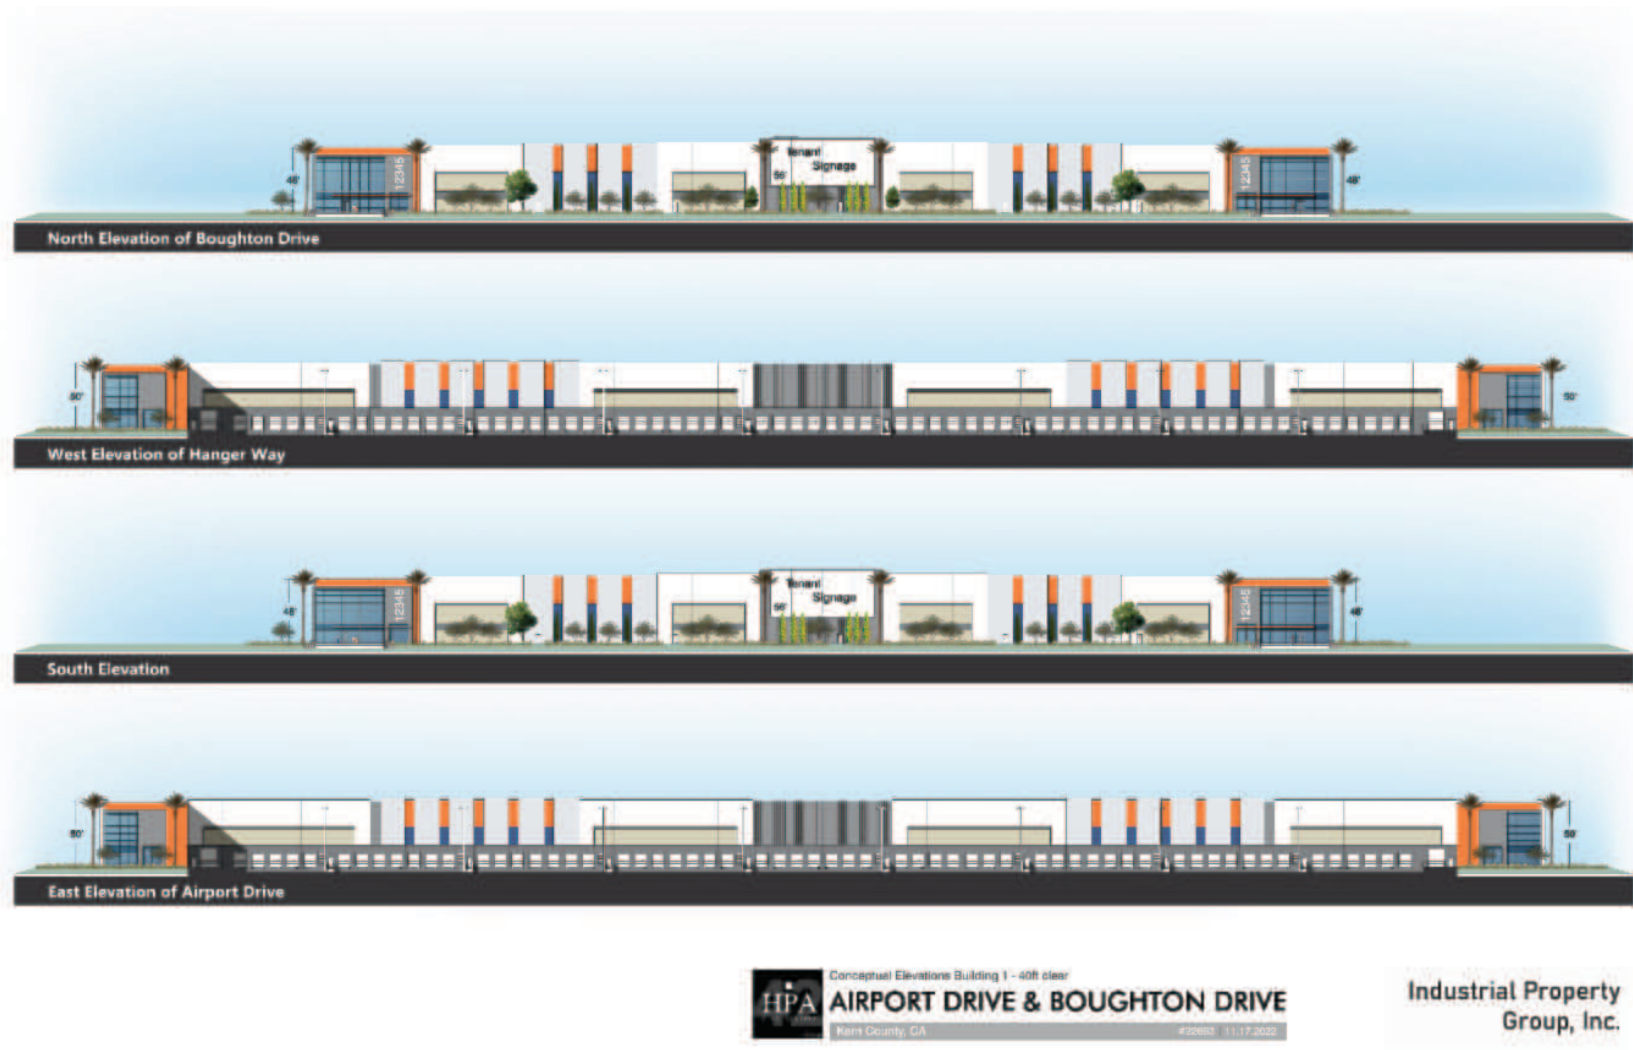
Precise Development Plan - Building 1 Elevations
